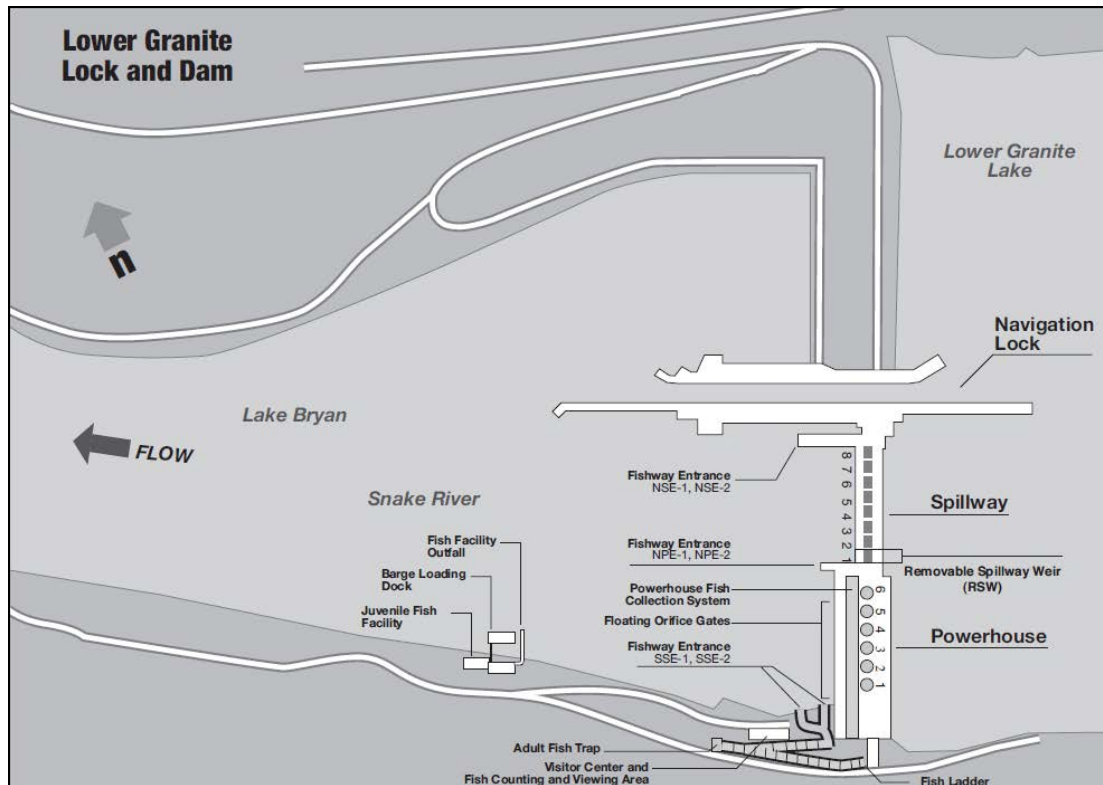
Lower Granite Lock and Dam general site plan (source: USACE)
